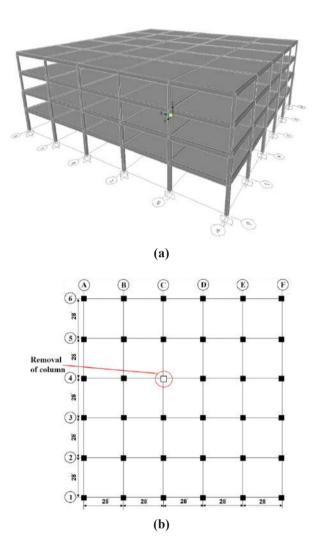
Prototype RC frame building: (a) 3D view and (b) Floor plan
